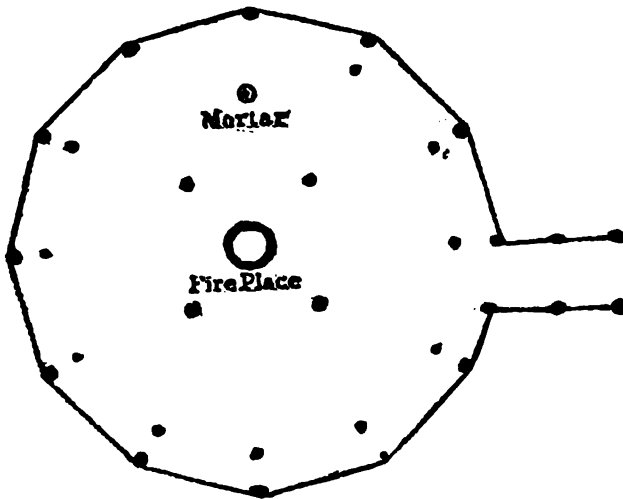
GROUND PLAN OF MANDAN HOUSE.
